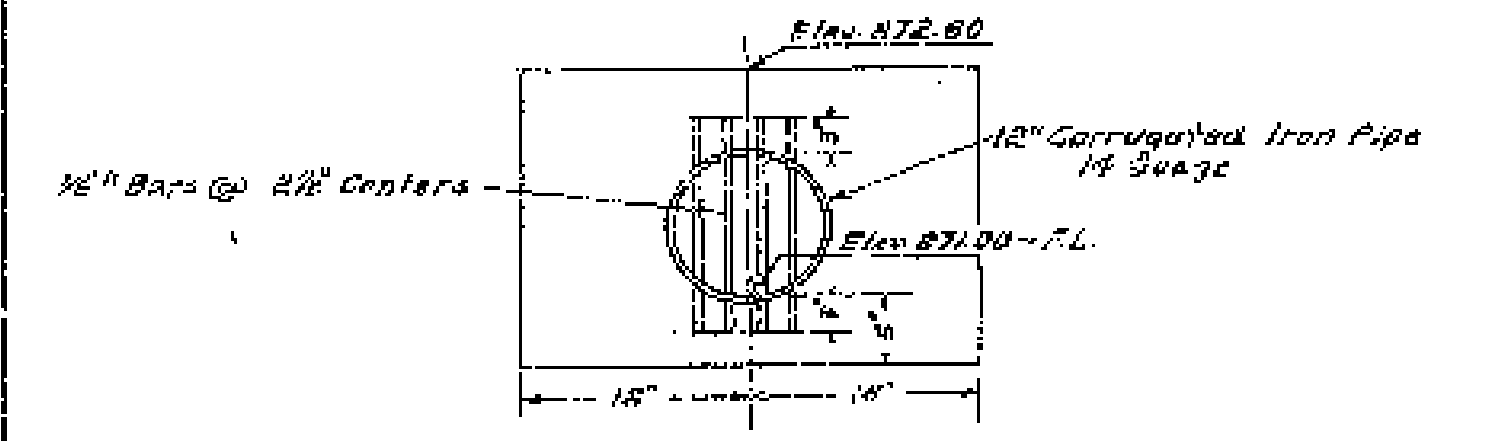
DETAILS OF DRAINAGE STRUCTURE AT STA. 7+50-SOUTH SIDE
